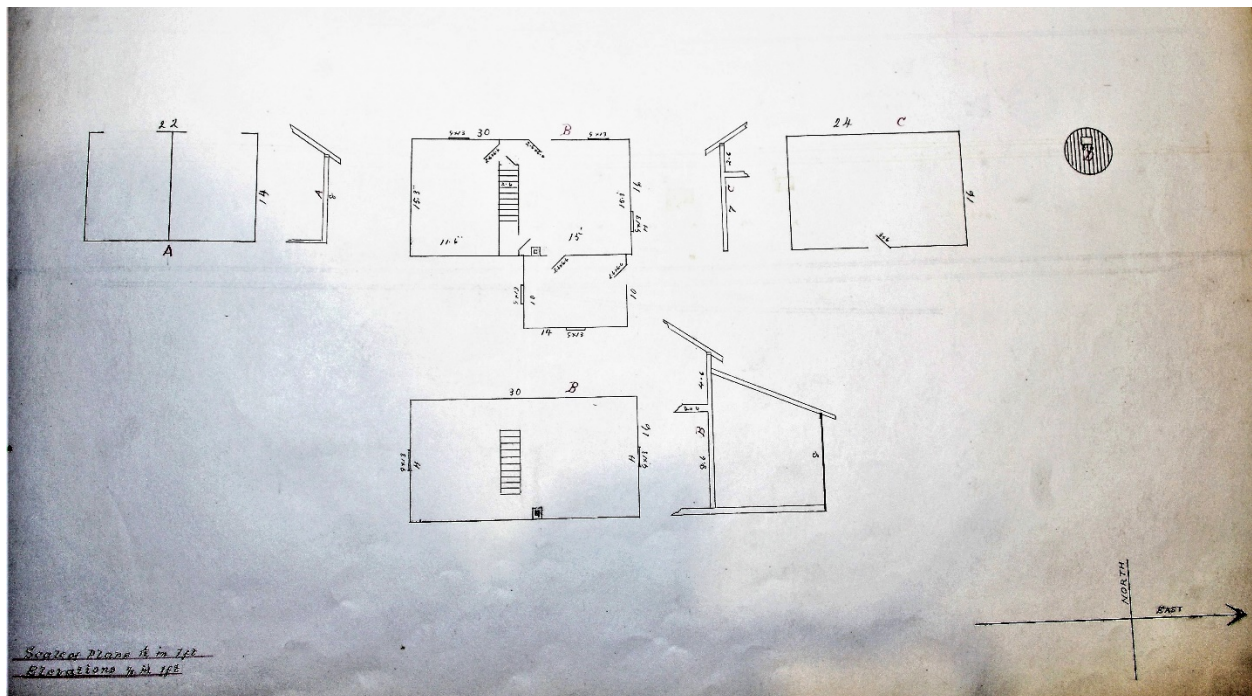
Matlin Section Station Building Sketches, ca. 1882, Courtesy of the California State Railroad Museum MS 79 Central Pacific Railroad Collection RG 3 Station plan book.
